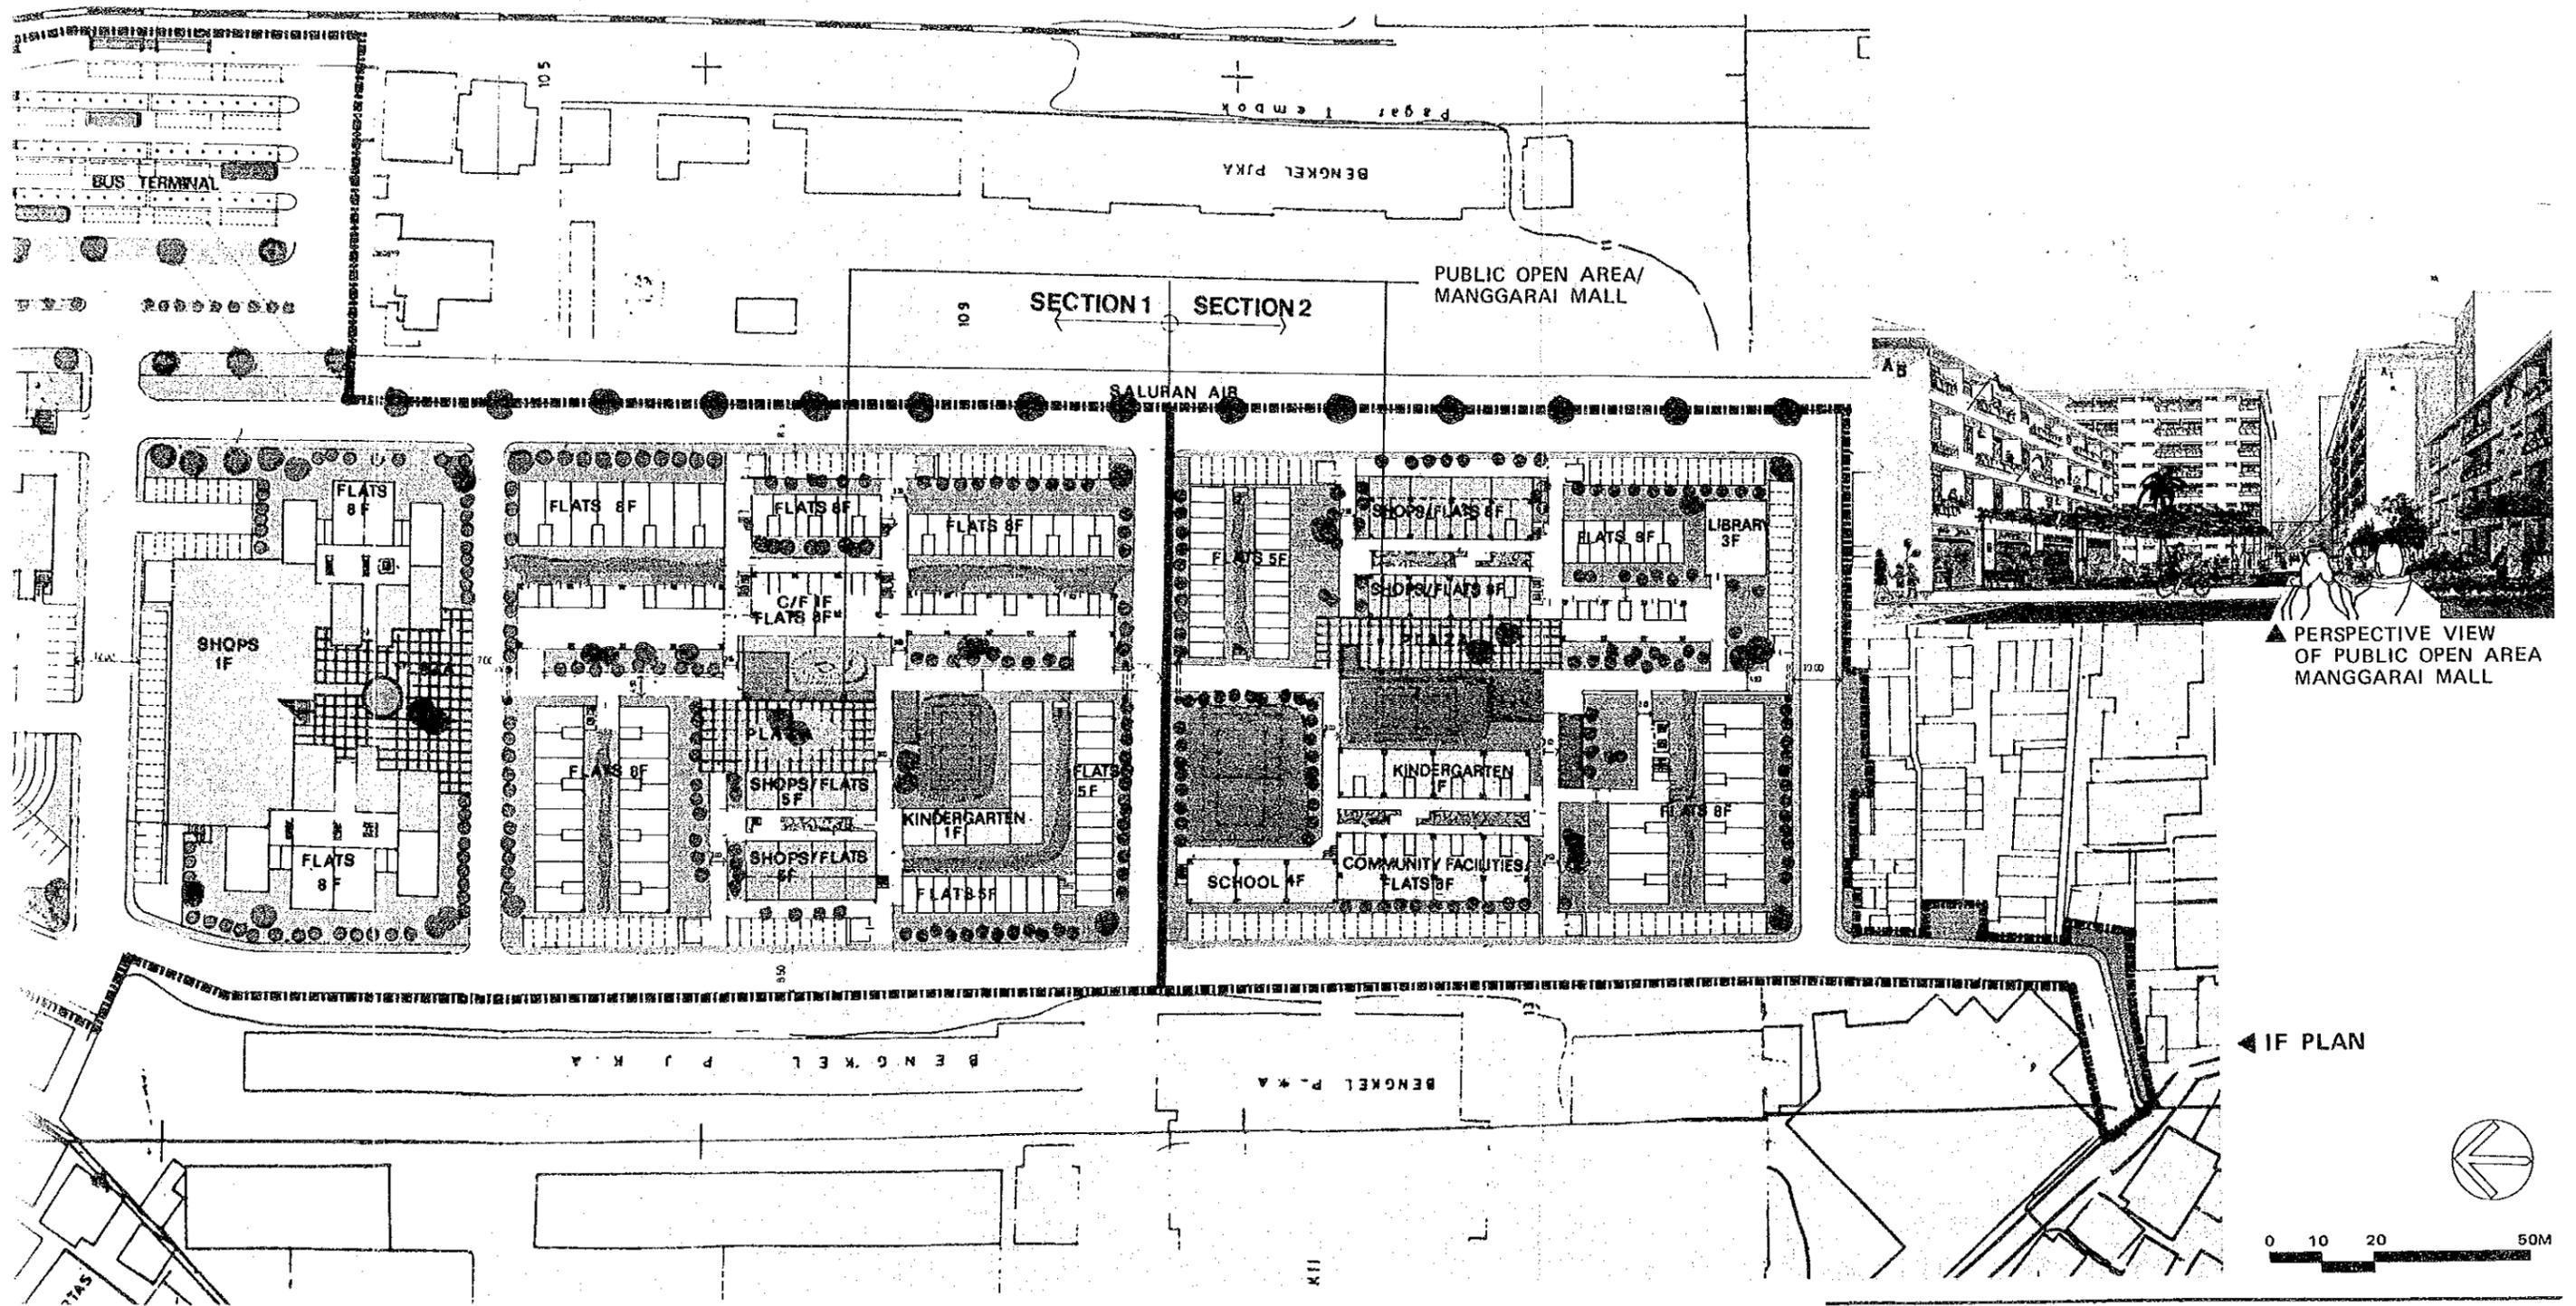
LAYOUT PLANNING - MANGGARAI
